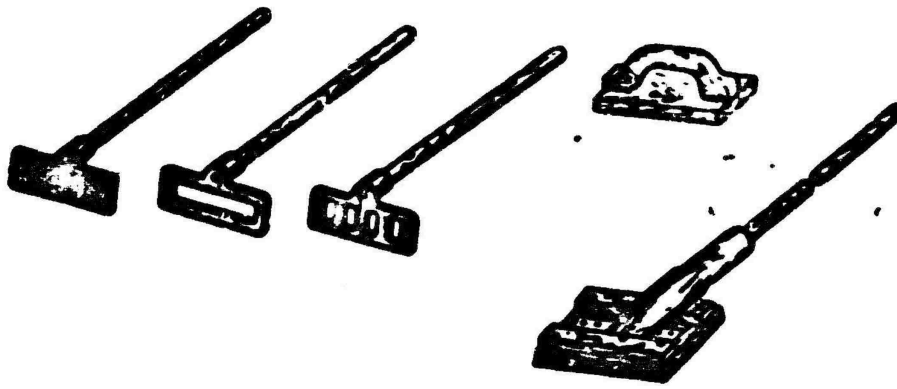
Rubbing and smoothing tools for finishing the surface of placed concrete mix.
